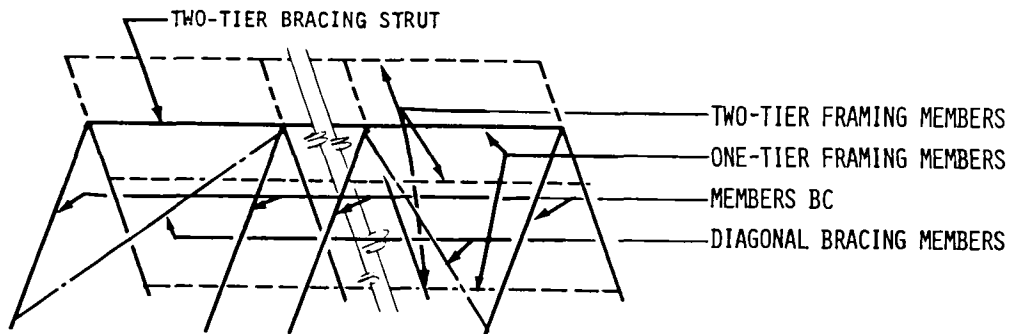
Two-Tier Structural Steel Connection of Member AC To Member BC
